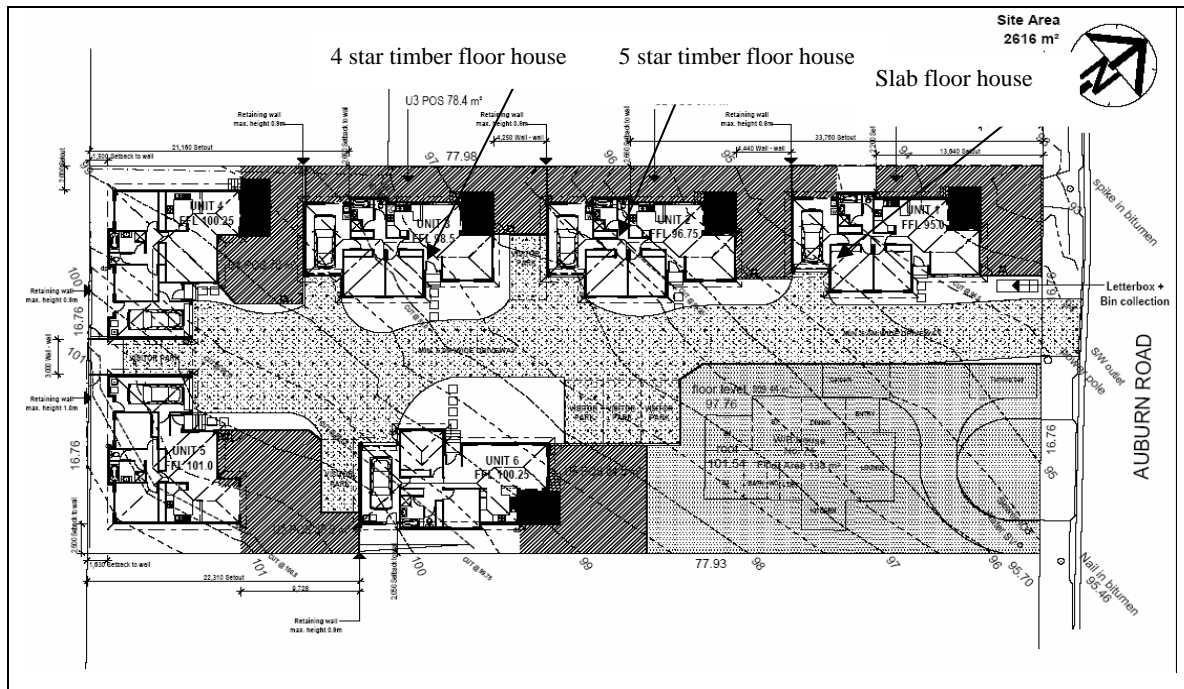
The building layout at Auburn Road Kingston (Source: Wilson Homes)
